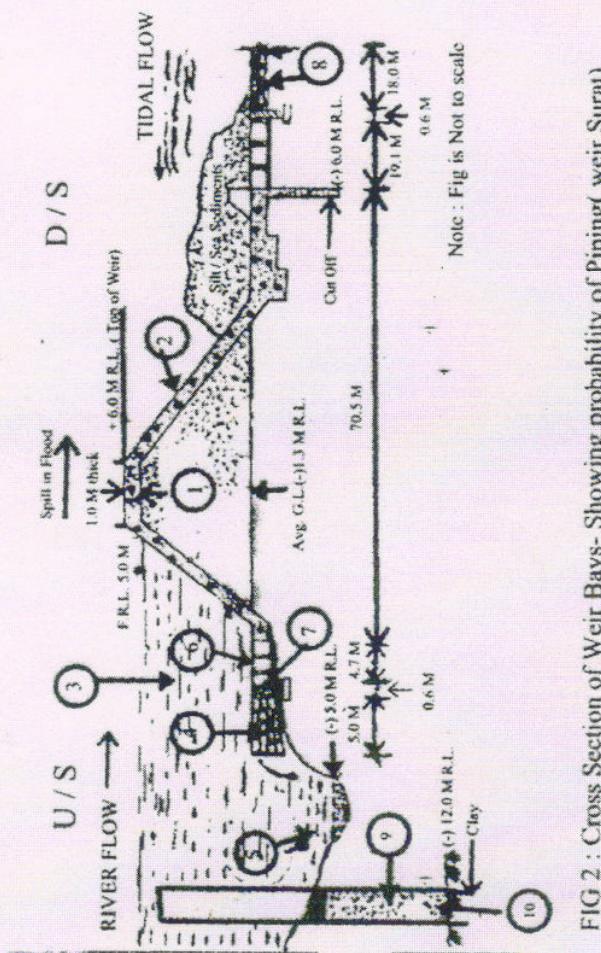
Cross Section of Weir Bays- Showing probability of Piping( weir Surat)
